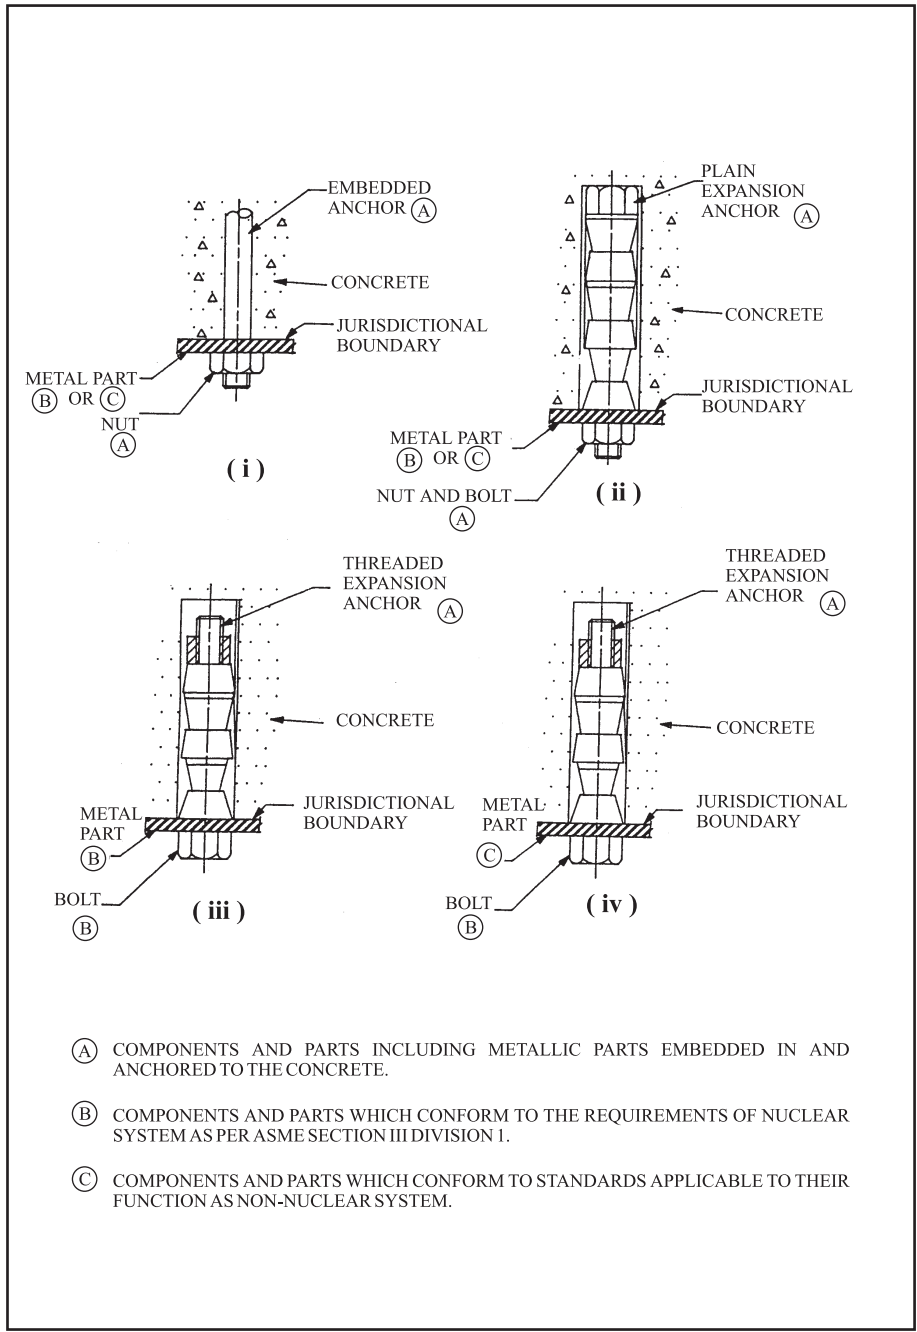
TYPICAL DETAILS OF ANCHORS AND JURISDICTIONAL BOUNDARIES
